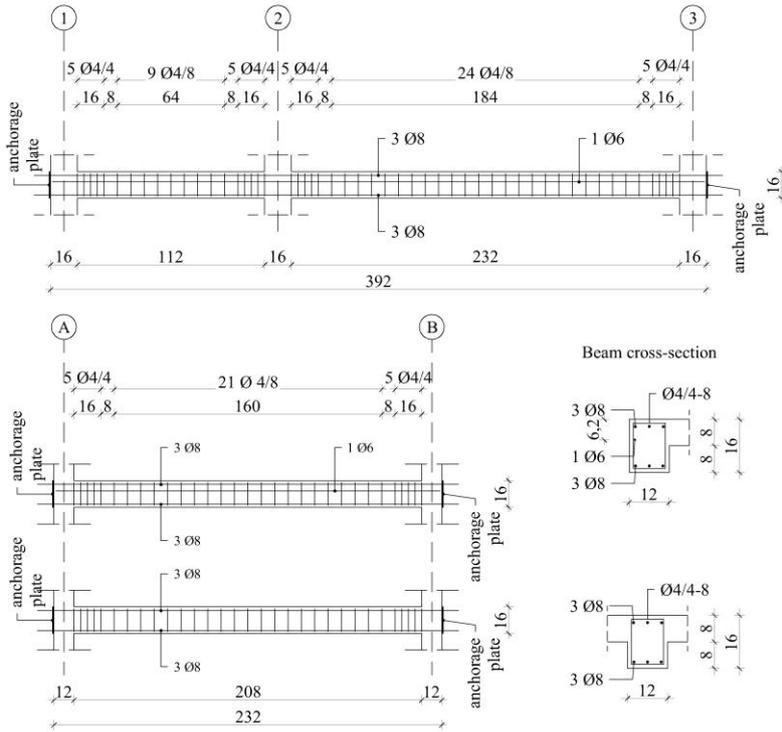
Beam reinforcement details (units in cm except for bar sizes)
